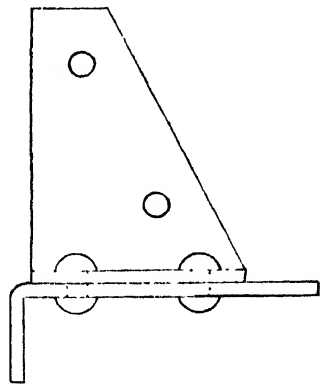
Shoe for securing foot of girder to wall-plate.
